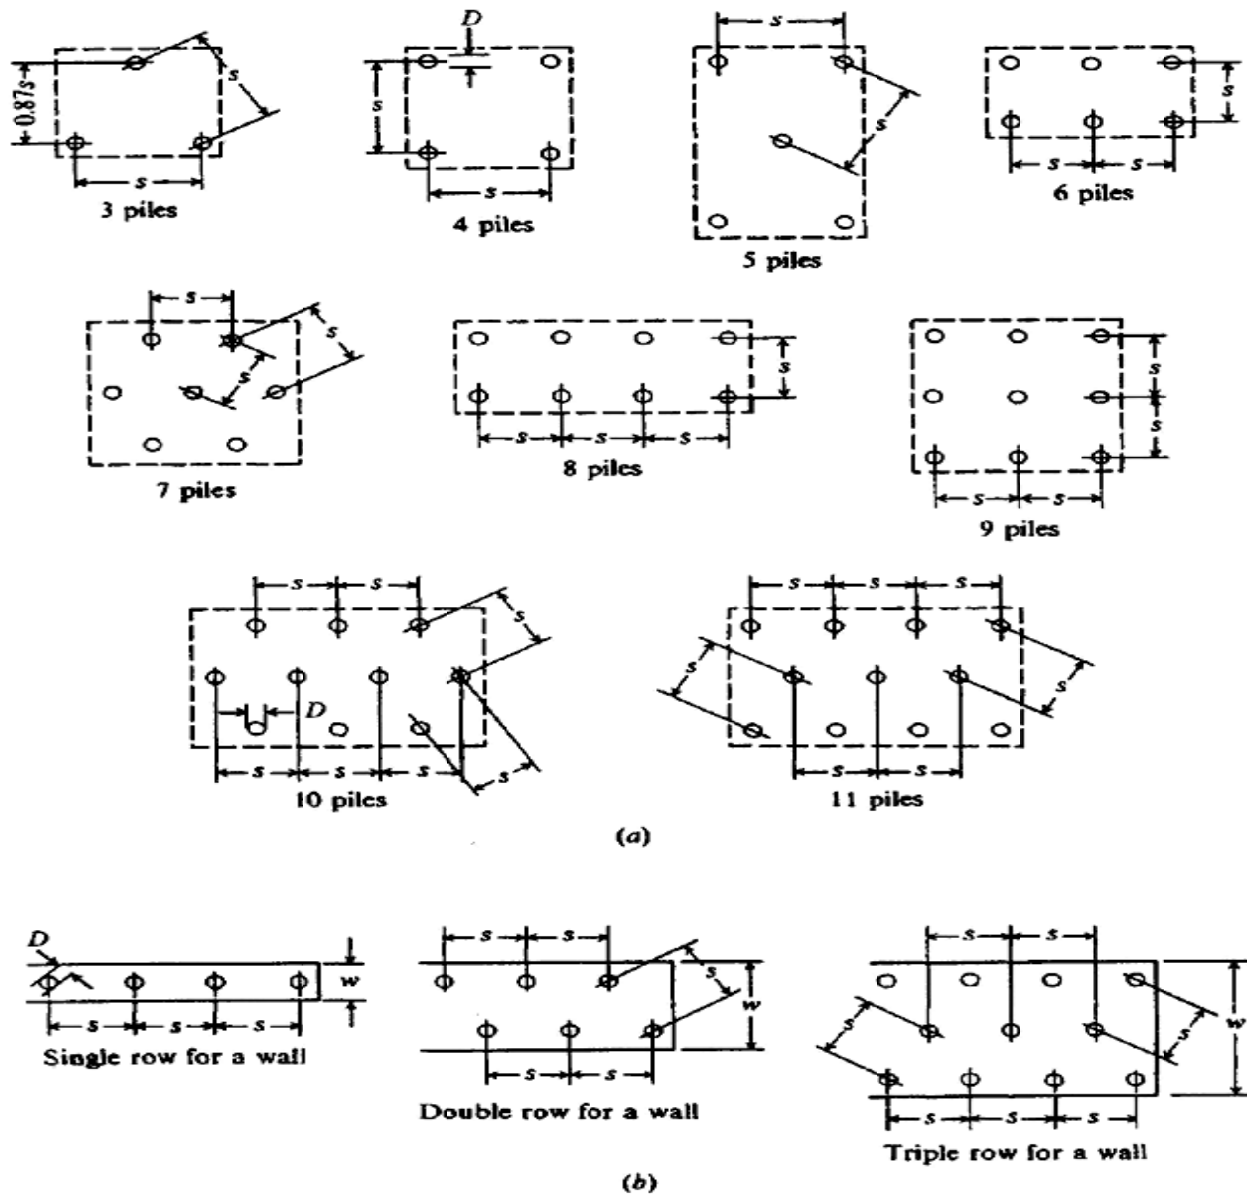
Typical pile-group patterns: (a) for isolated pile caps; (b) for foundation walls.
